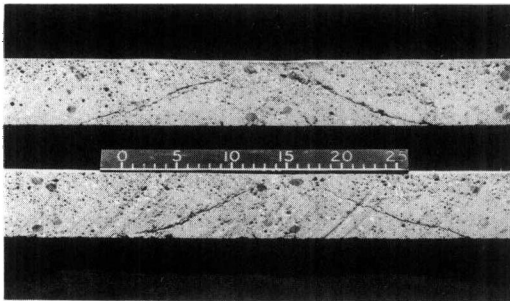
Section through a concrete slab after hard impact, showing an incipient concrete plug.
